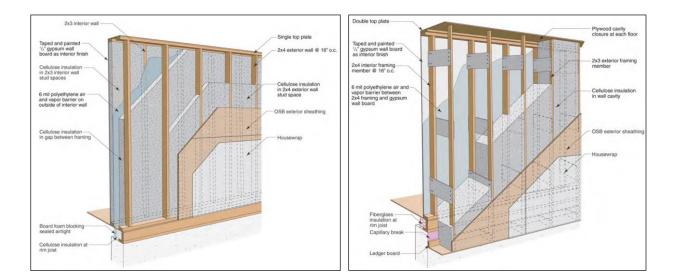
Double stud wall (left), and a Truss wall (right) (Straube & Smegal, 2012).
